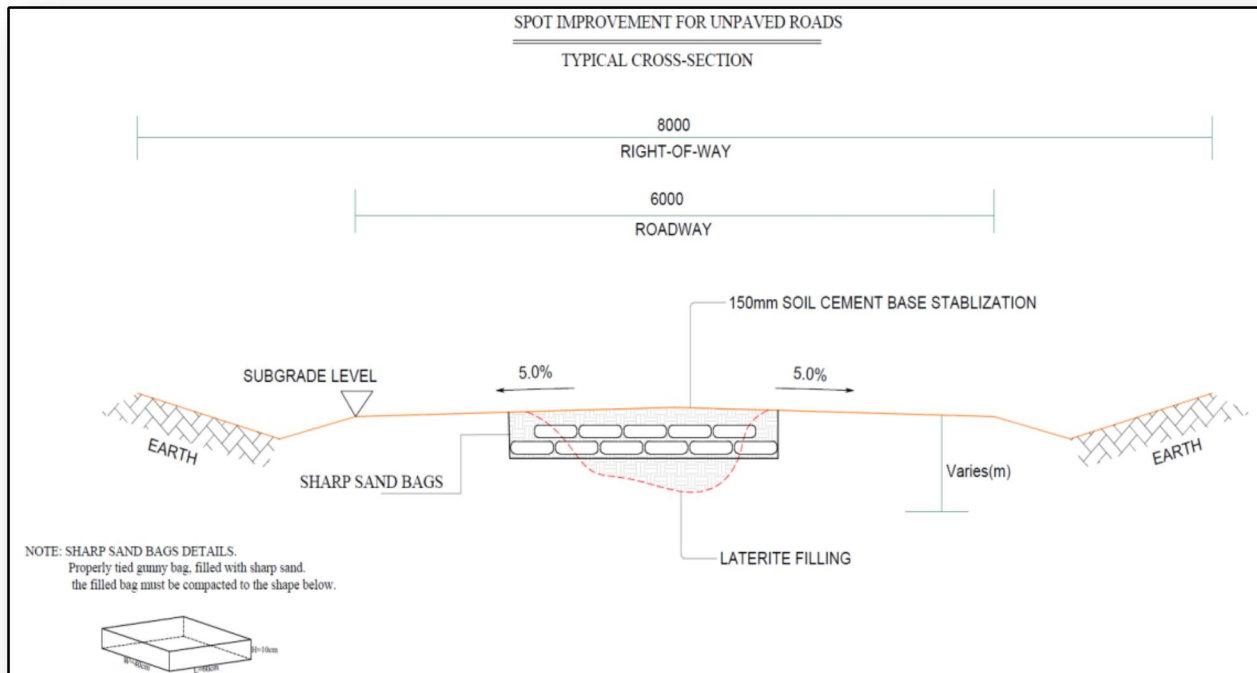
Restoring/Replacement of Subgrade for Earth Road
